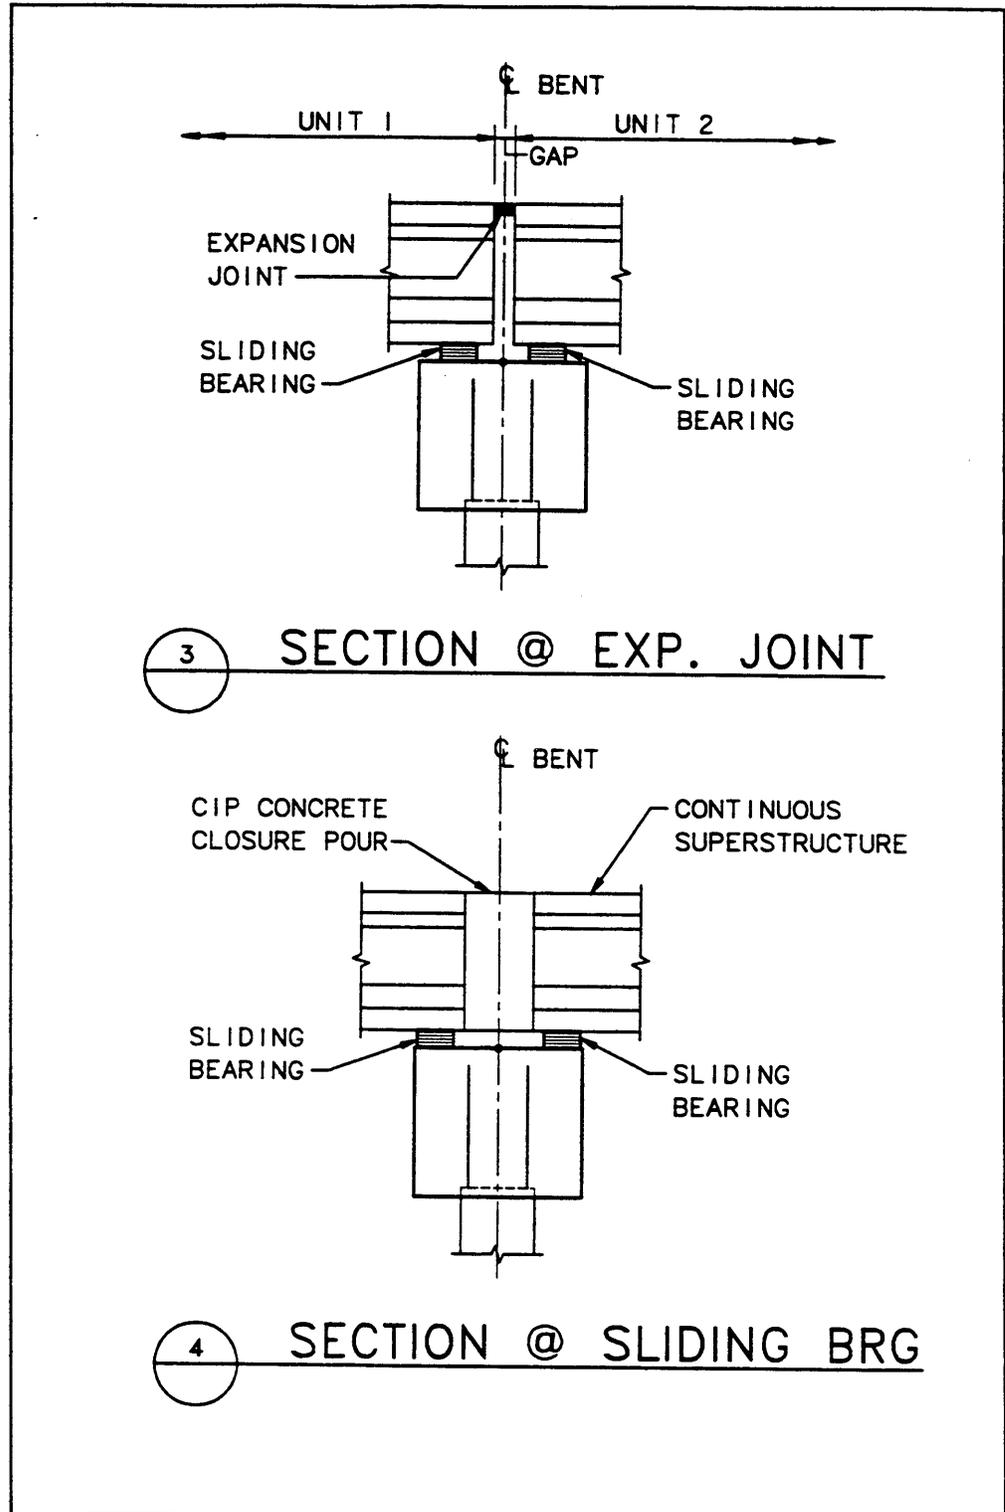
Bridge No. 7 - Sections at Bents with Sliding Bearings
